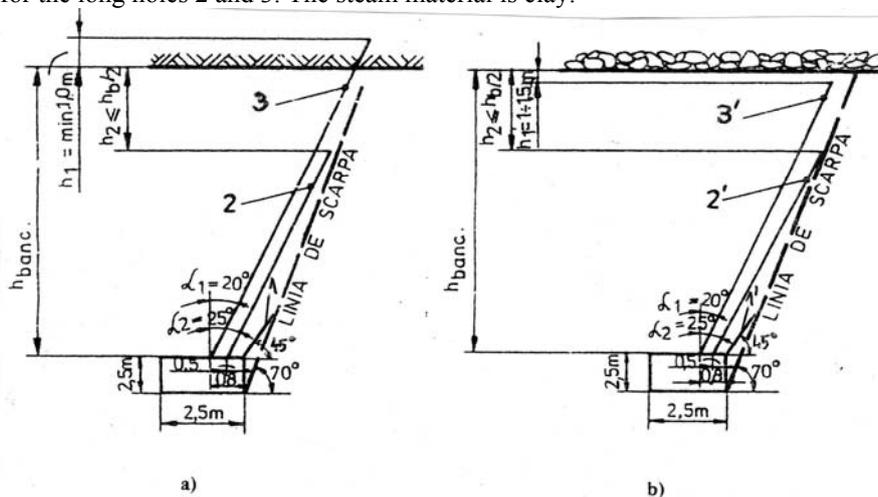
Long hole placement scheme for training mine delimiting surface start workings of subversion: a - operating under the ceiling nature b – operating under artificial ceiling;
